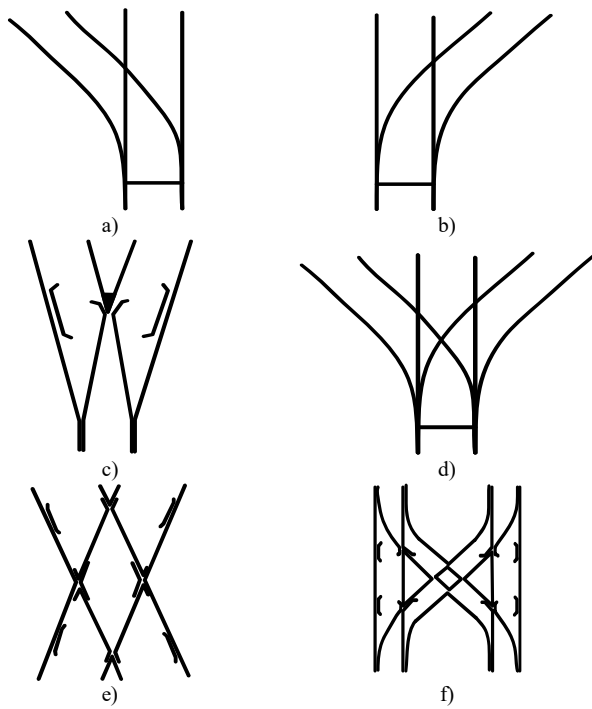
Railway switch types a) Single left switch b) Single right switch c) Symmetric switch d) Compound switch e) Cross switch (full cross) f) crossover [13-15]
